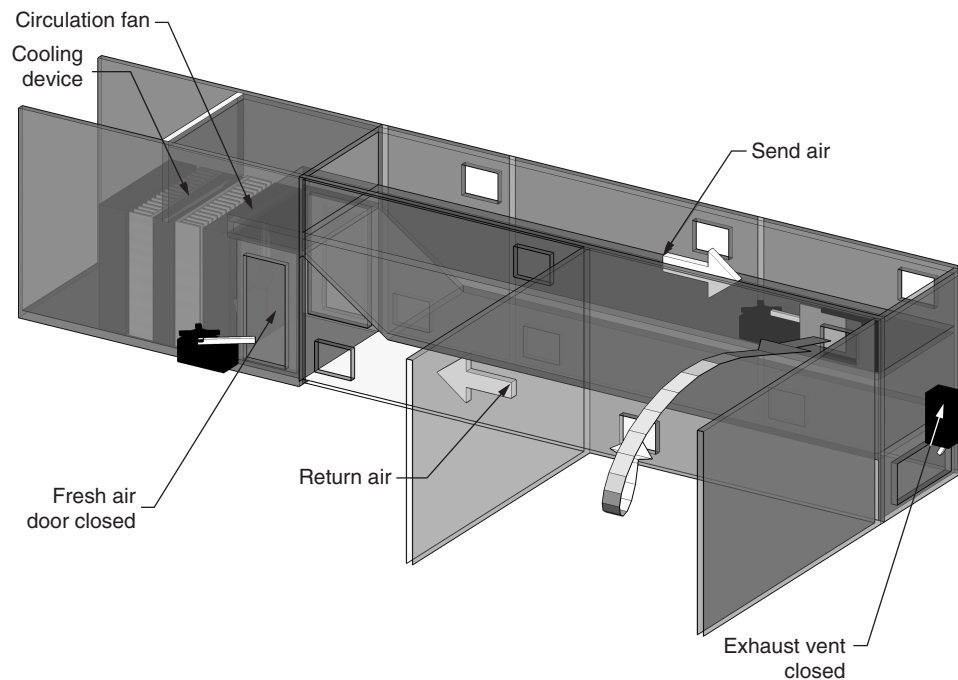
CAD “cutaway” drawing of cooling tower bypass doors in “recirculate” mode.
